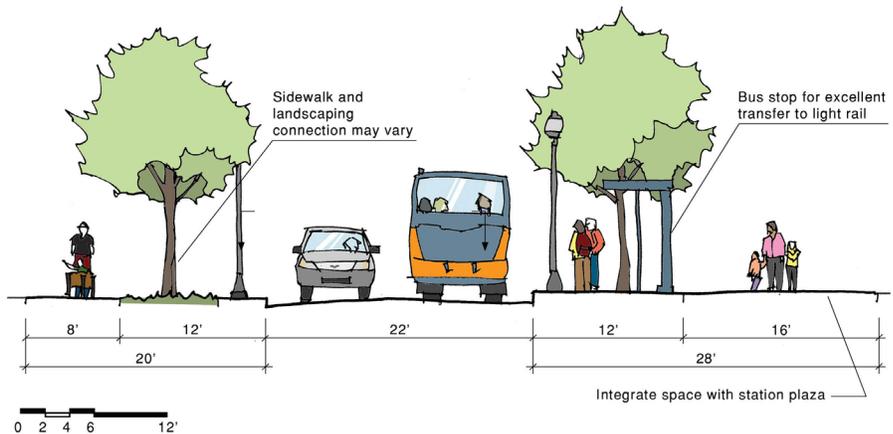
Envisioned street section for Brooklyn Avenue NE between NE 43rd and NE 45th Streets.
